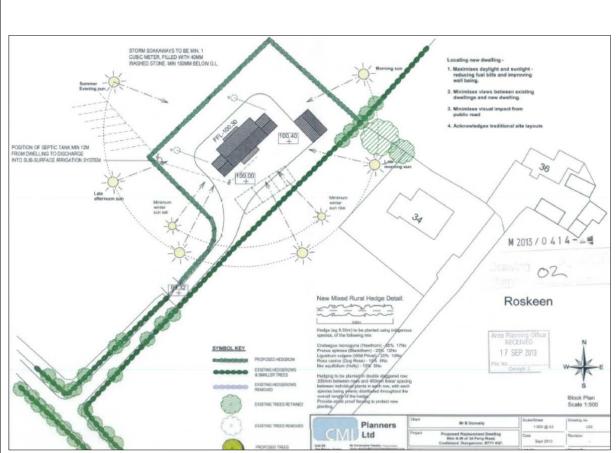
Block plan of dwelling and garage approved under M/2013/0414/F
